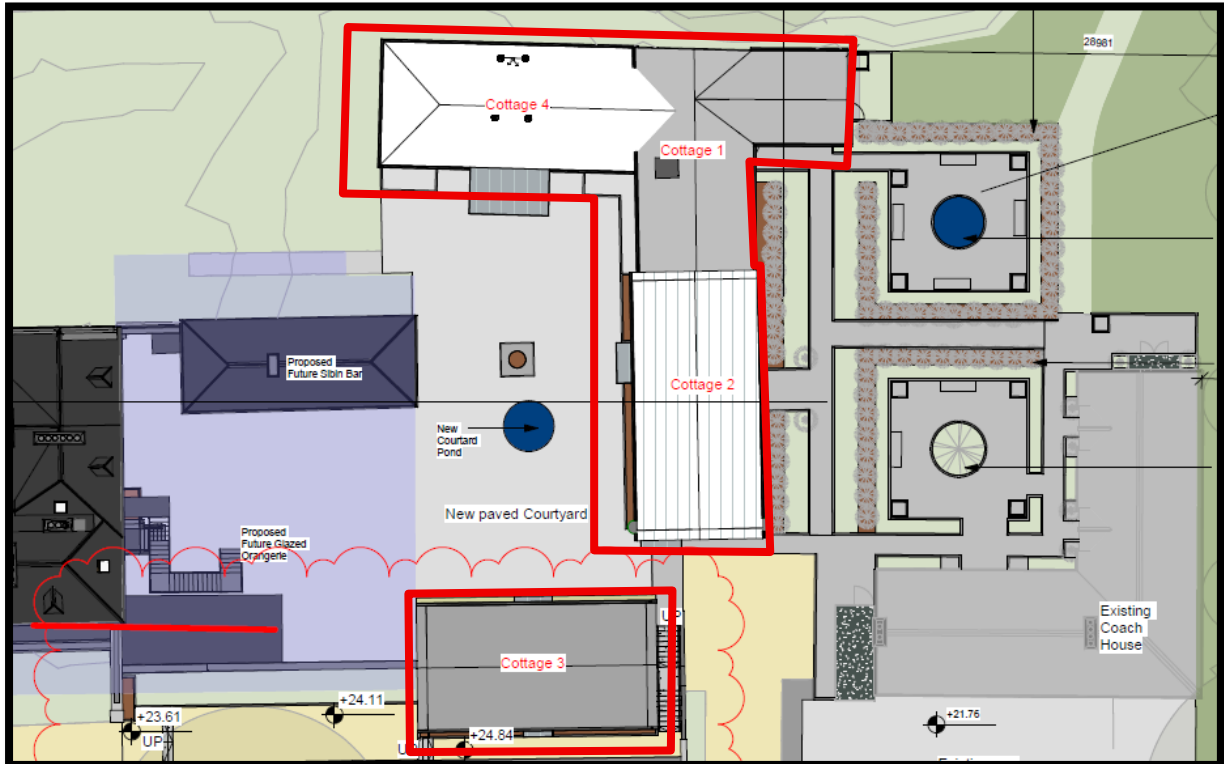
Site Layout – Proposed our cottages highlighted in red
